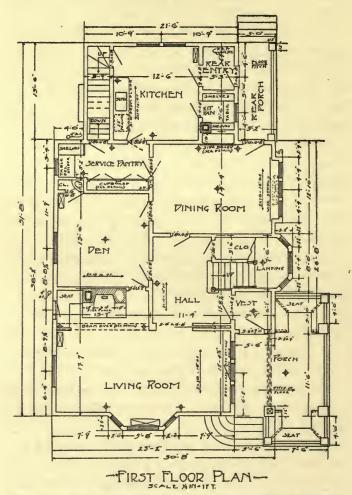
First-Floor Plan of a Residence at Champaign, Ill.
